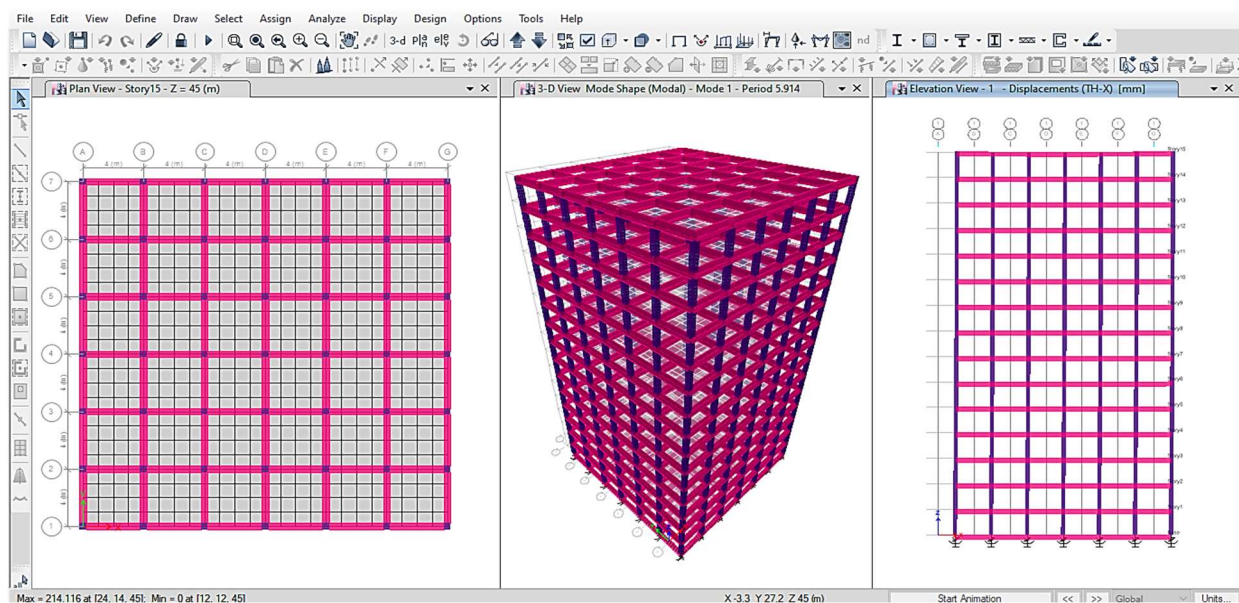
Plan, 3D & Elevation view of FPS base square plan building
